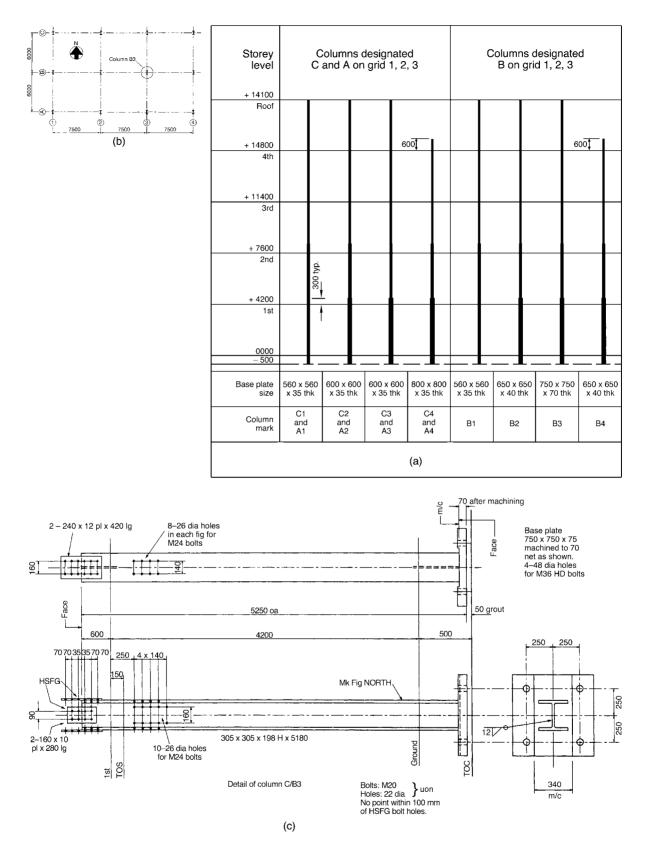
Multi-storey building column: (a) column schedule; (b) key plan grid (based on BS 5950 and EC3 specifications); (c) detailing
